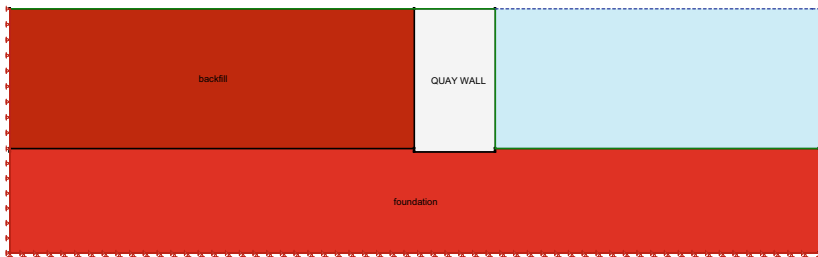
A typical quay wall model with backfill soil, foundation, and seawater
